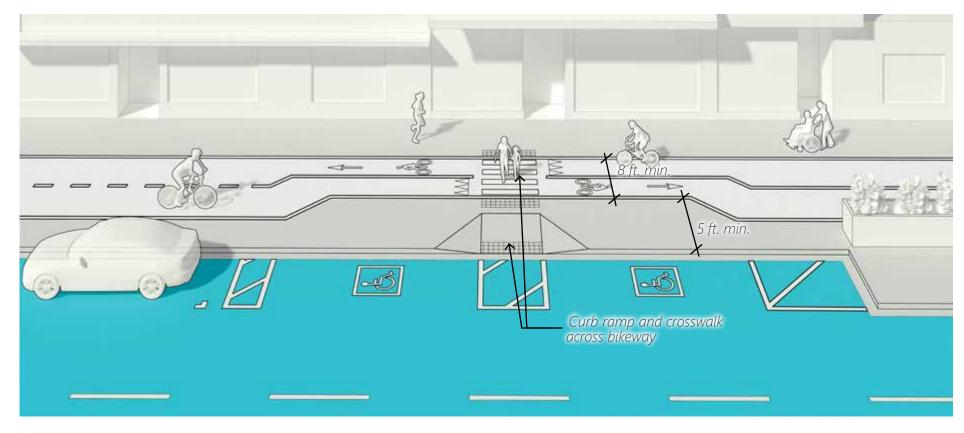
Two-Way, Sidewalk-Level, Class IV Bikeway at Accessible On-Street Parking.
